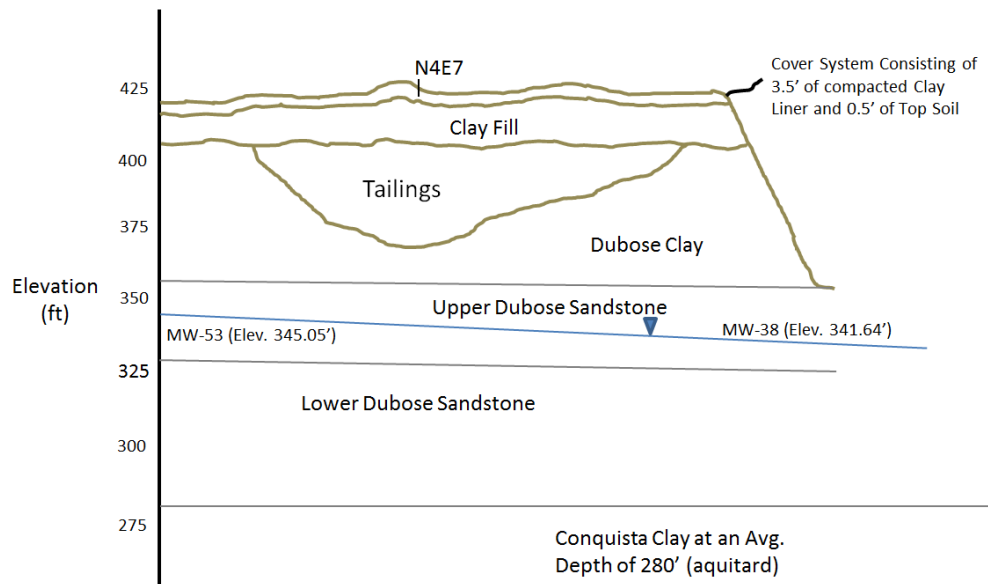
Cross Section of Conquista Tailings Impoundment
